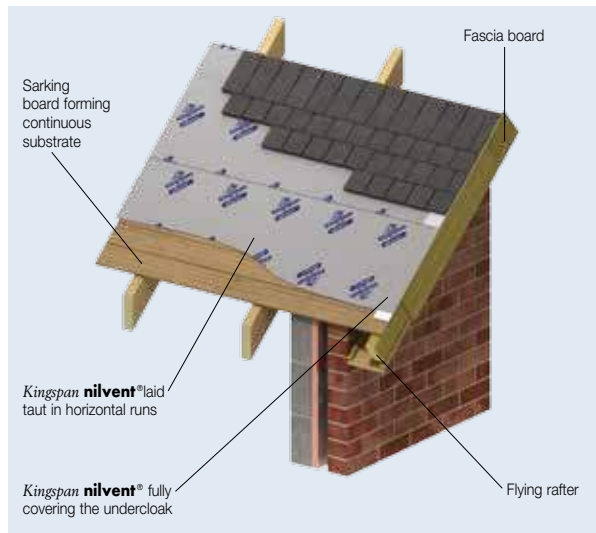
Verges – Fully Supported Horizontal Installation with Natural Slates
